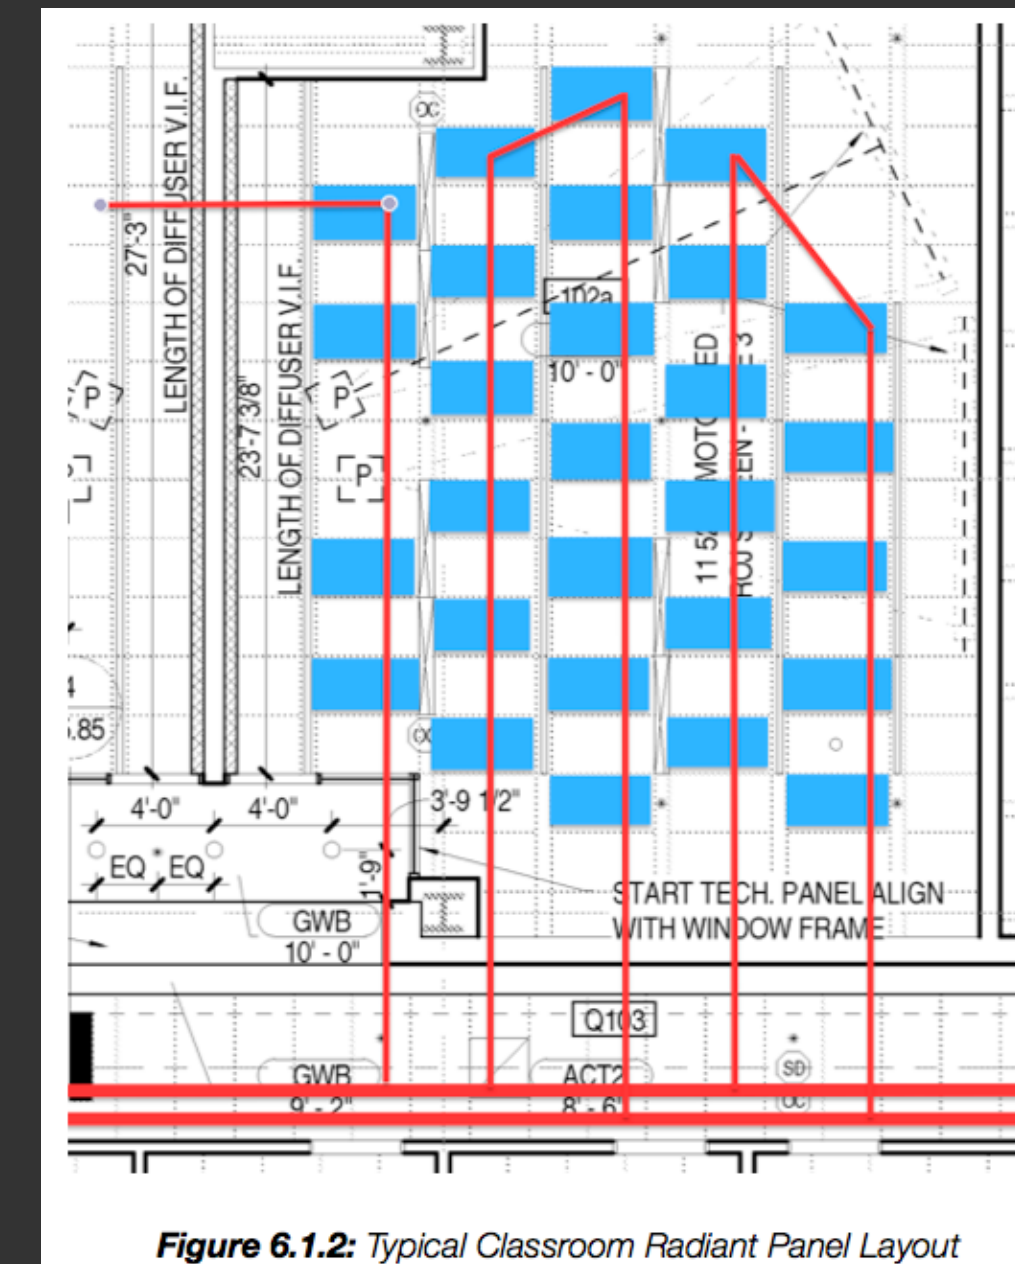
Typical Classroom Radiant Panel Layout
